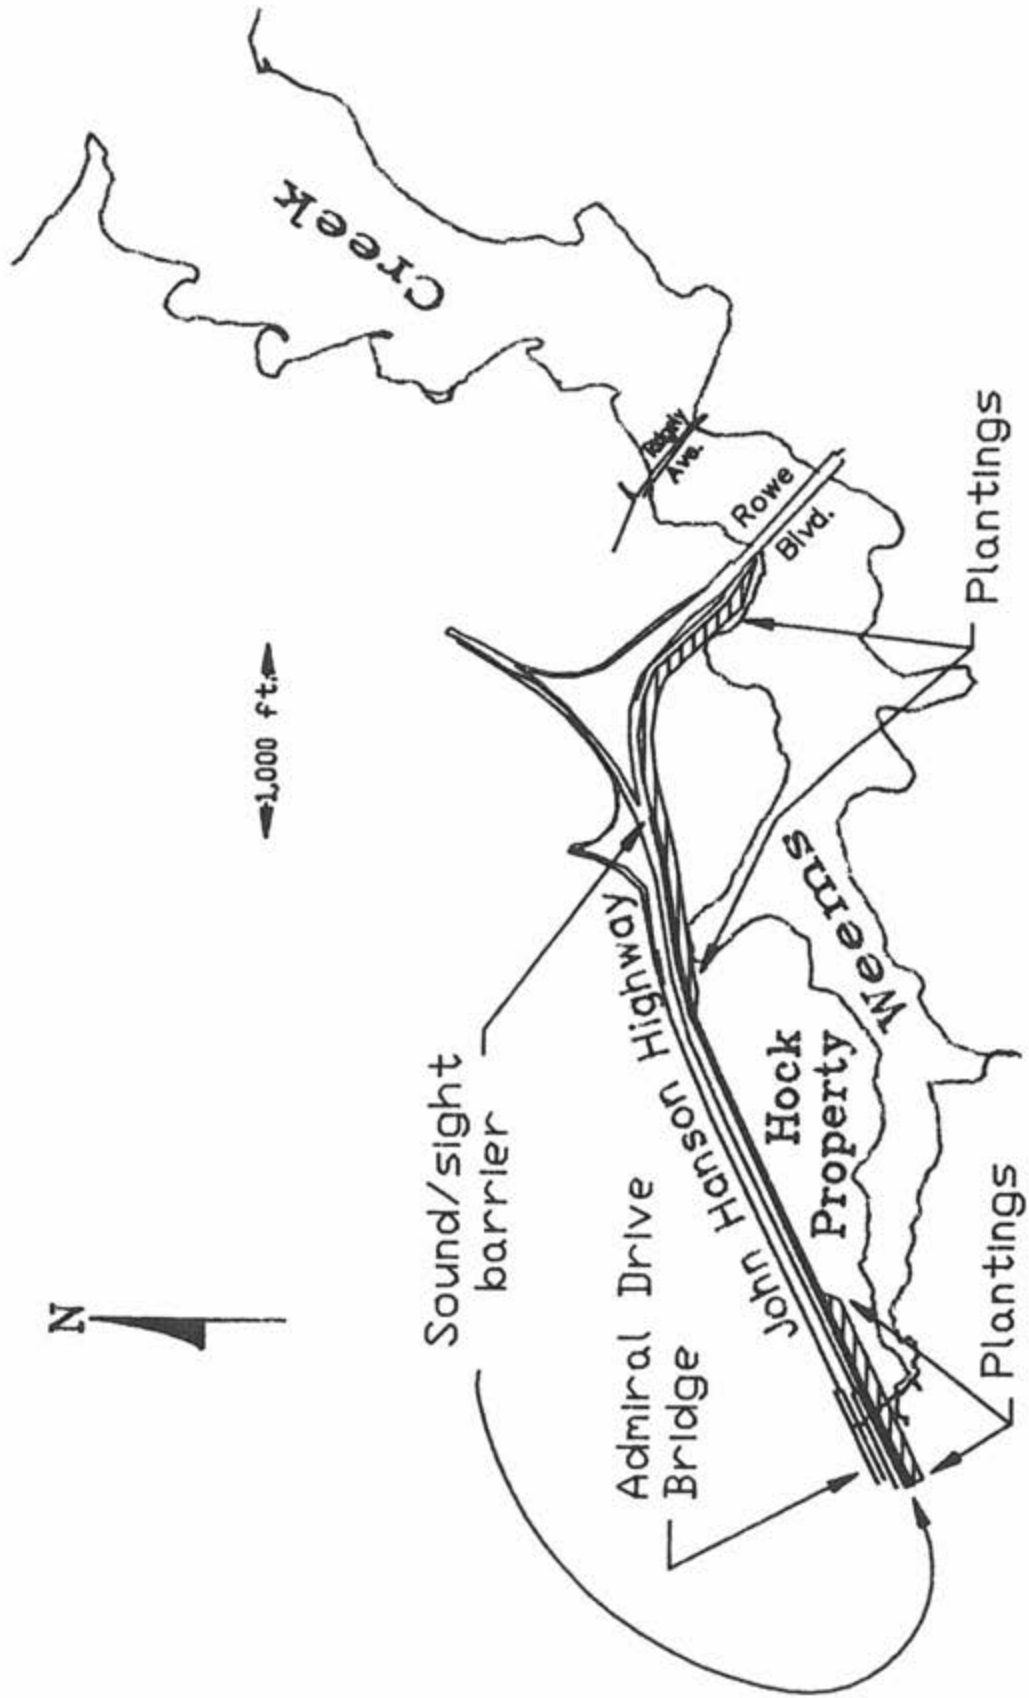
Buffering plan, showing plantings and sound/sight barrier.
